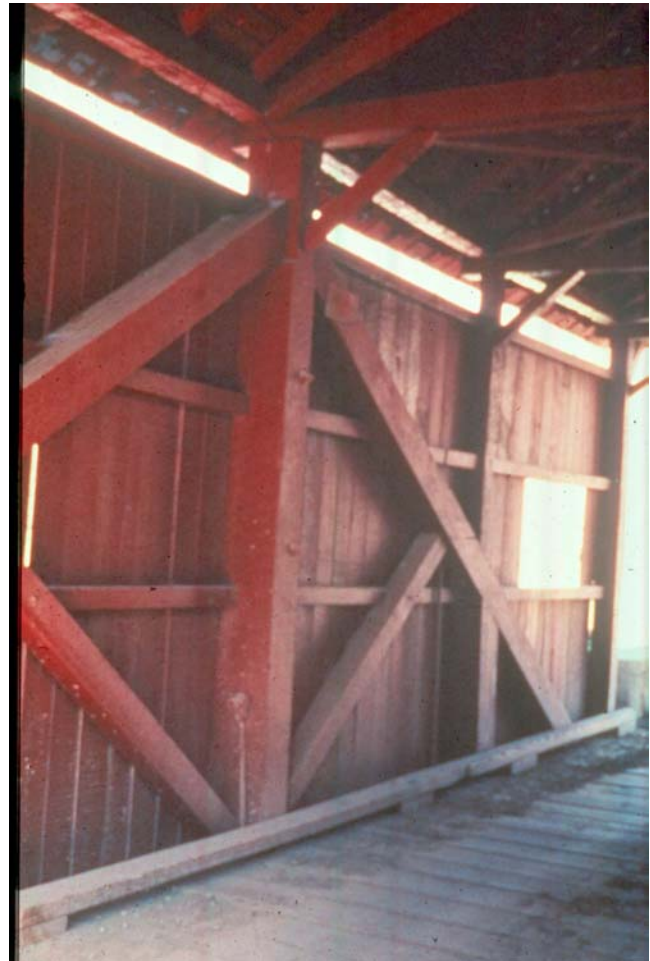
Inside View of Covered Bridge Showing King Post Truss Design
